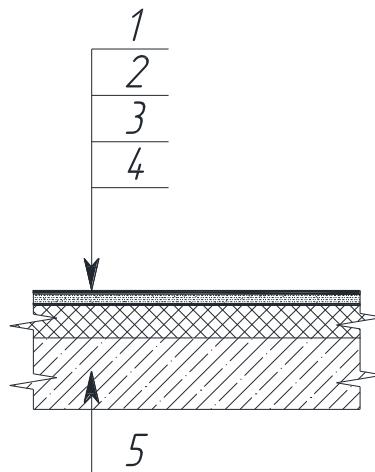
Design scheme of the basement slab: 1 – linoleum; 2 – cement-sand mortar; 3 – ruberoid layer; 4 – thermal insulation expanded polystyrene; 5 – reinforced concrete slab
